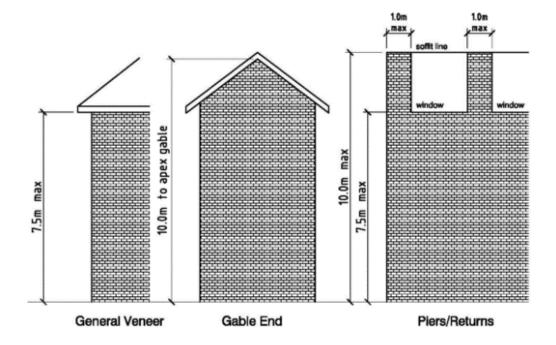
Maximum Veneer Heights for two-storey running bond construction – diagram sourced from Clay Brick & Paver Manufactures association
